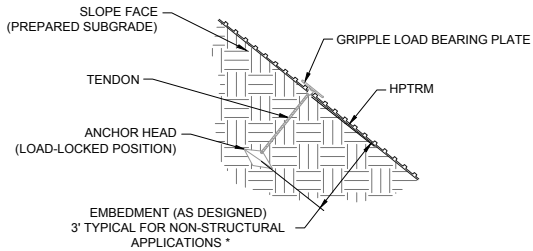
EARTH PERCUSSION ANCHOR DETAIL
